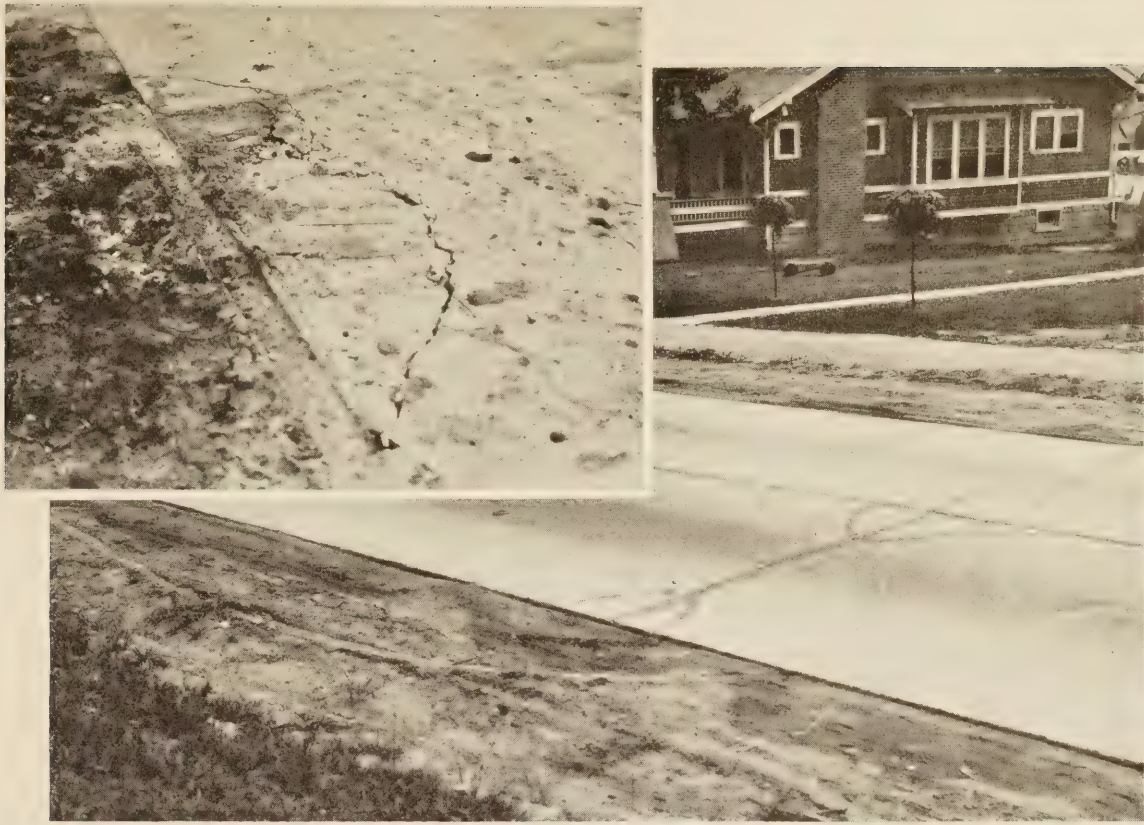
CORNER CRACKS ALONG THE EDGES AND CENTER JOINT CAUSED BY HEAVY LONGITUDINAL REINFORCEMENT IN BOND. THE UPPER PICTURE SHOWS A CORNER BREAK CAUSED BY TRAFFIC AND FOLLOWED BY PROGRESSIVE BREAKING DOWN
